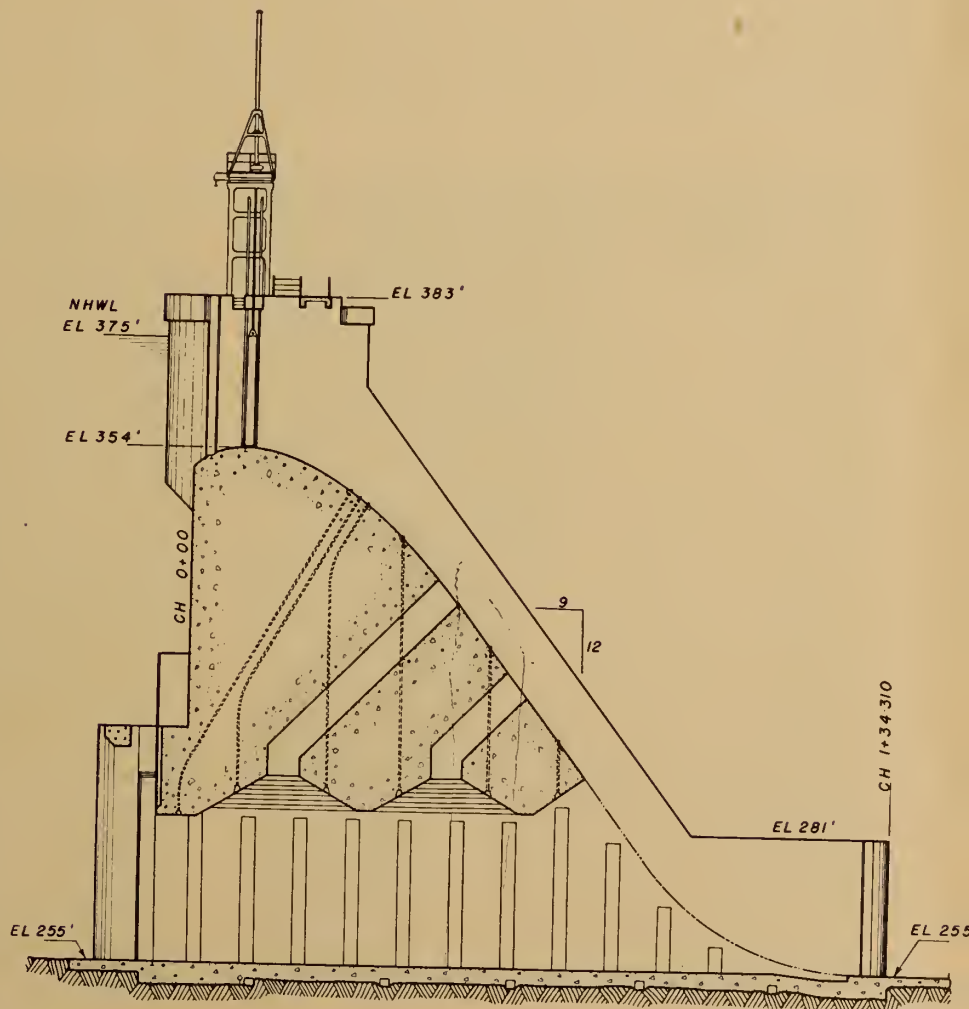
Typical section through No. 2 regulating spillway showing by-pass opening.
